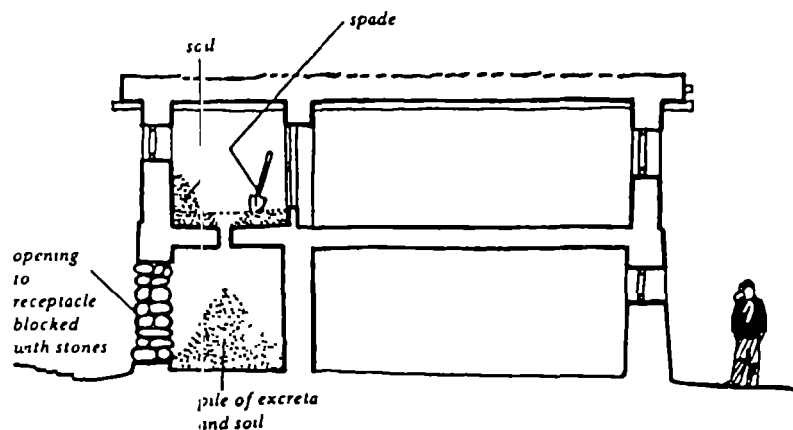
Section through a Ladakhi house with indoor, upper-floor earth toilet
